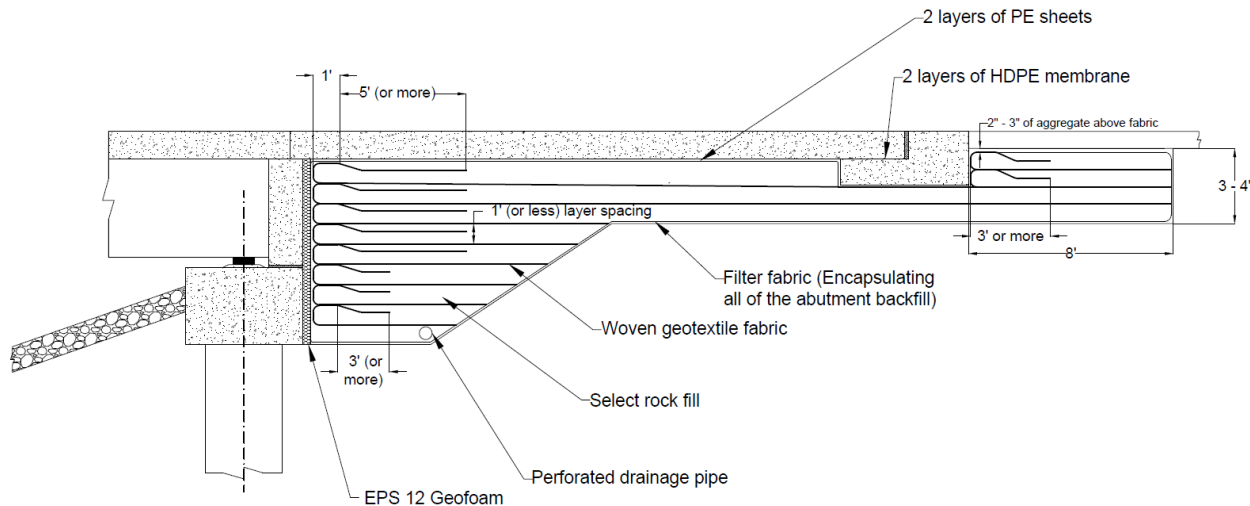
Proposed abutment detail for future TxDOT bridges
